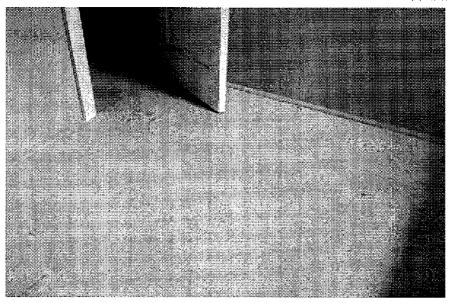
Beige vinyl floor tiles containing asbestos located in the kitchen on the first floor of the residential tenancy at 91B Liverpool Road.
